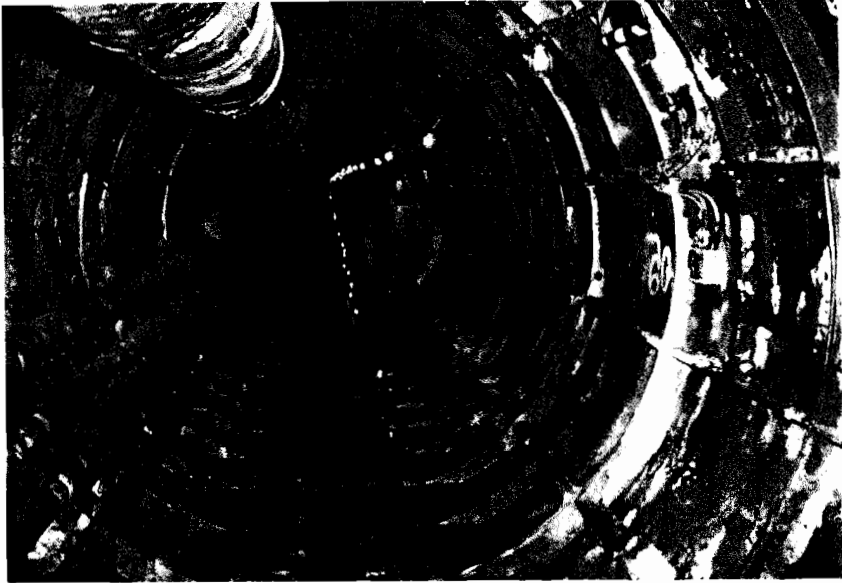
Steel Segmented Tunnel Liner, Staten Island, New York
